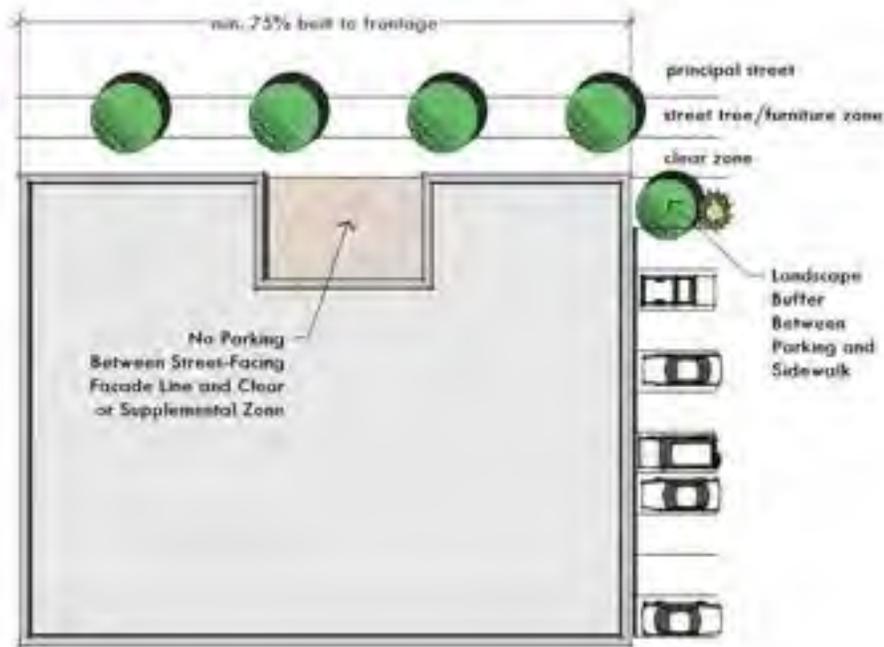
No parking is allowed between the street and the building façade and when parking is located to the side of a building, screening is required between the parking and the sidewalk (NBS Core Transit Corridor example).
